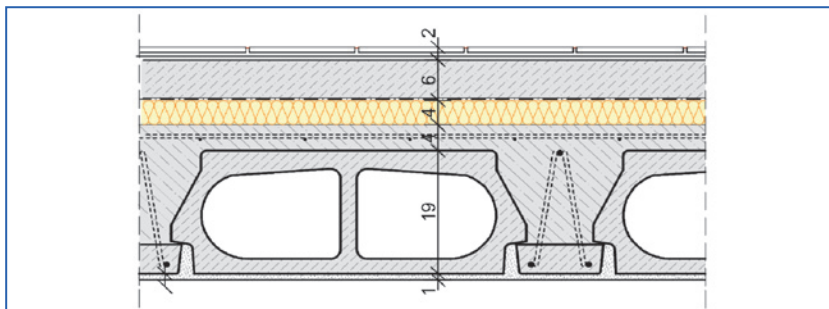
Cross-section of the most typical heavyweight floor construction, the layers from top to bottom: floor tiling, screed, foil, impact sound insulation layer, beam-and-hollow-block floor system with concrete upper layer, parge coat.
